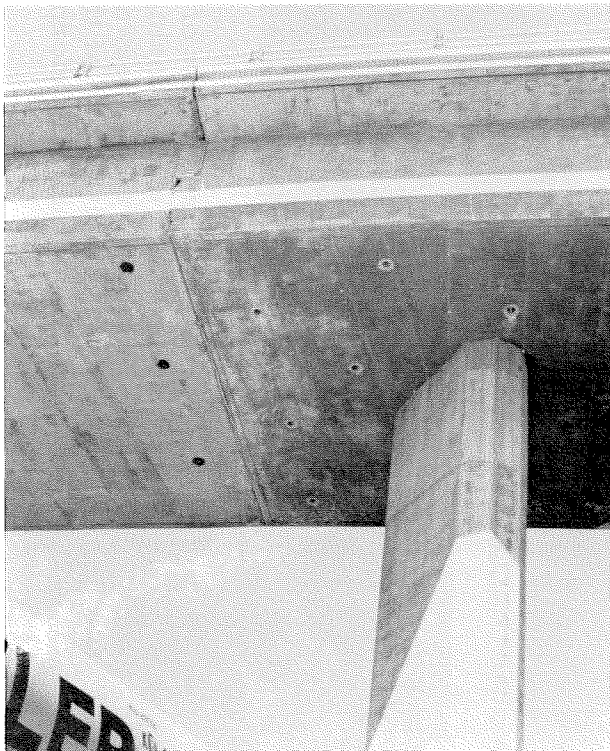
Joint and column on the remaining western portion of the collapsed overcrossing, Golden State-Antelope Valley freeway interchange.
